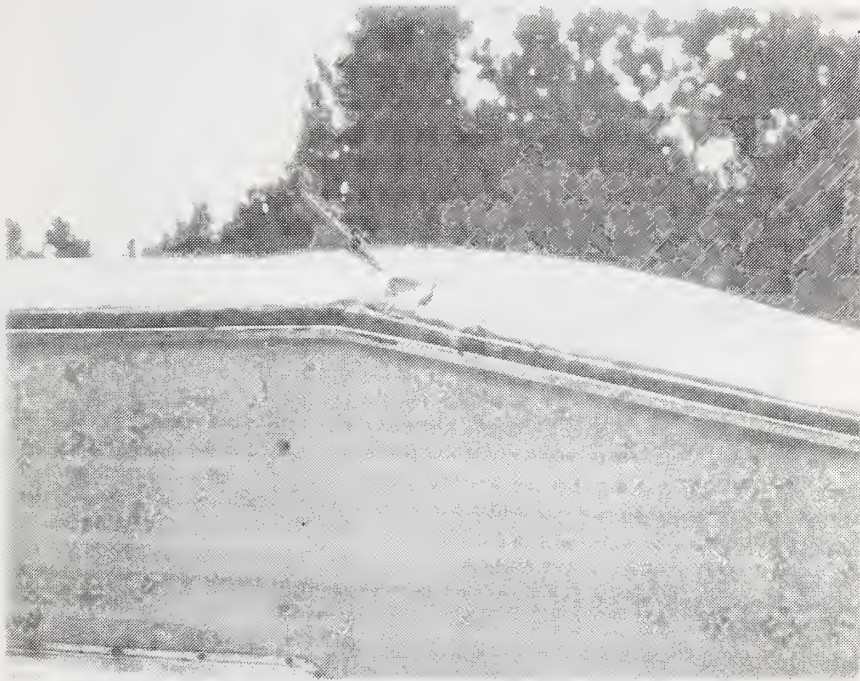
Crimped Steel Membrane at Change in Slope of Roof
